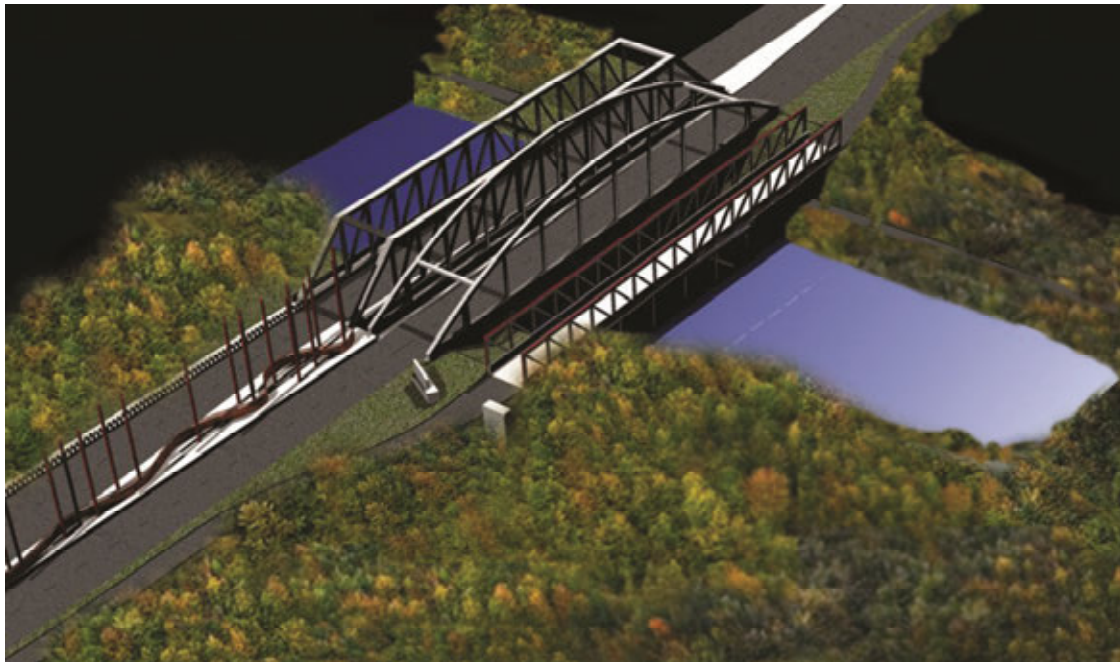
Cowichan River Trail Bridge and Gateway Concept
